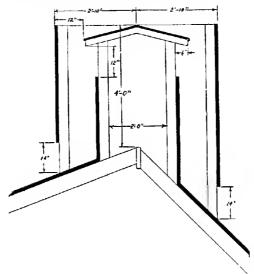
Fig. IV.—Details of construction of double-walled ventilator. Warm air the top of the shaft through the continuous opening 12 inches in width at the top of the inner wall; the opening at the bottom of the outer wall permits cold air to enter and pass up between the walls, assisting the draught, while the upper portion of the outer wall keeps snow or rain from blowing into the shaft.
